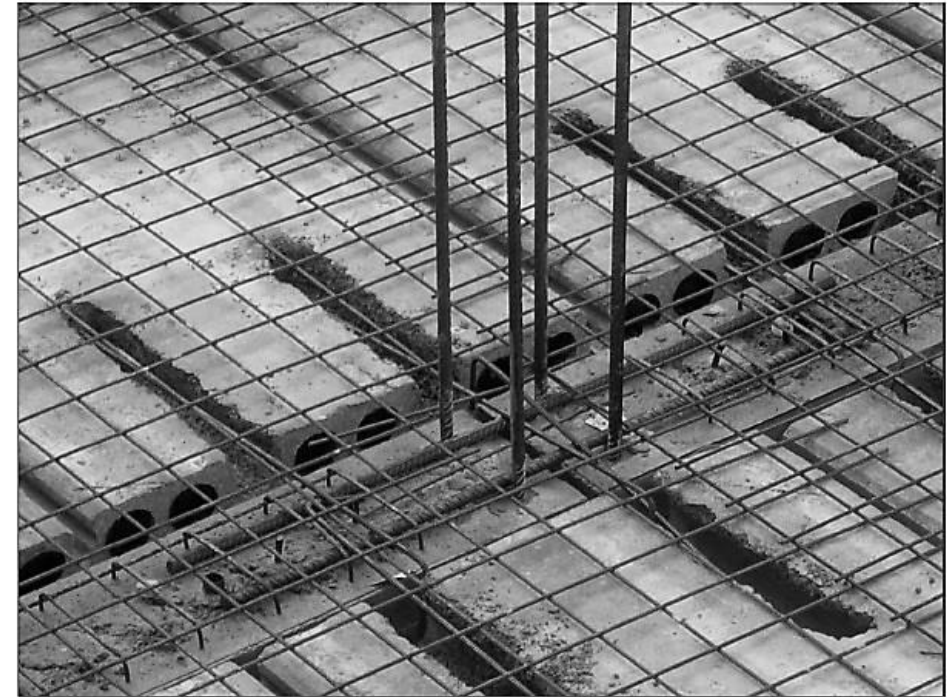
Composite inverted-tee beam showing mesh in the topping as well as tie steel into the slots in hollow core floor units. (Courtesy of Ergon, Belgium.)
